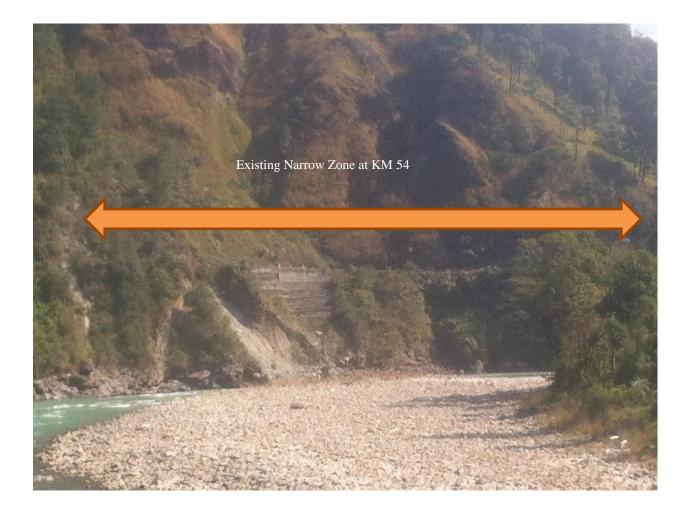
(Balance 130 m stretch length of Narrow road zone at KM54)
